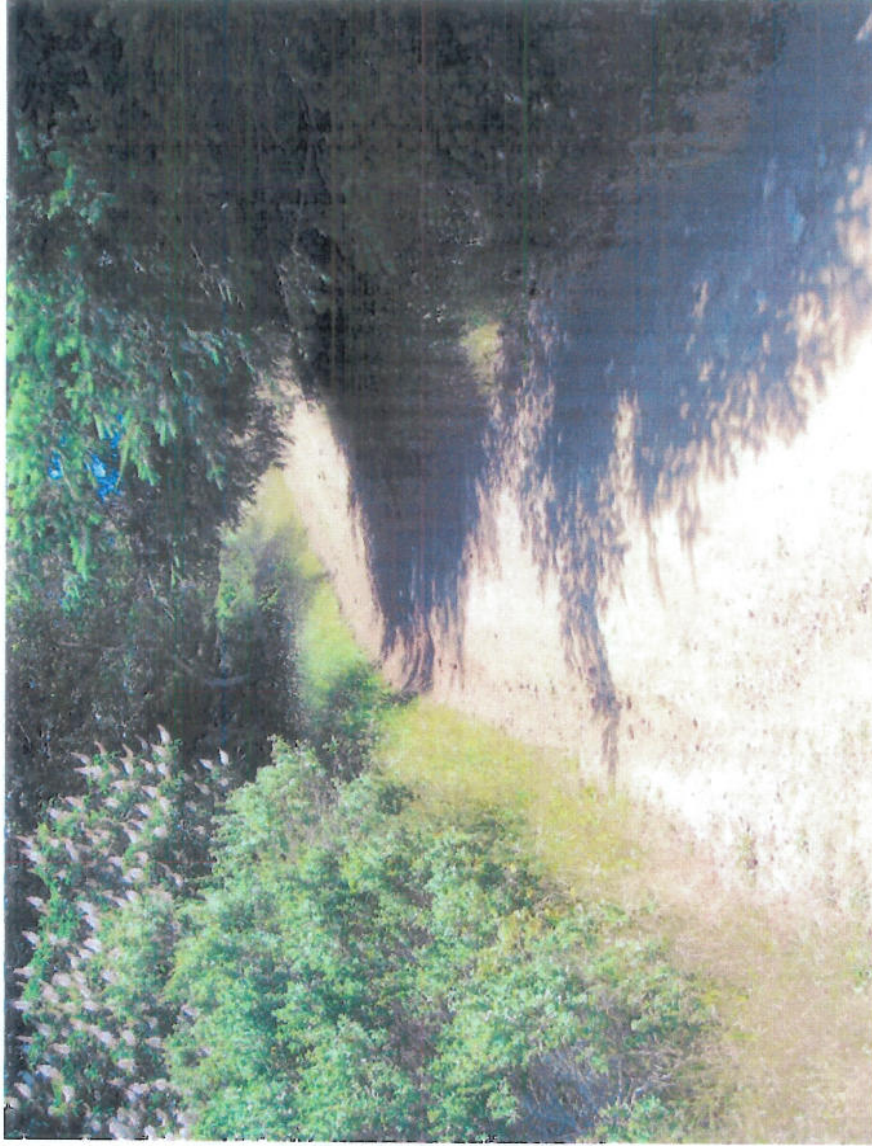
View of Barnabe Road looking upslope from Bill's Trail. The rut (photo left) continues for approximately 60-80 ft. up a steep section of the road (about 22% slope).
